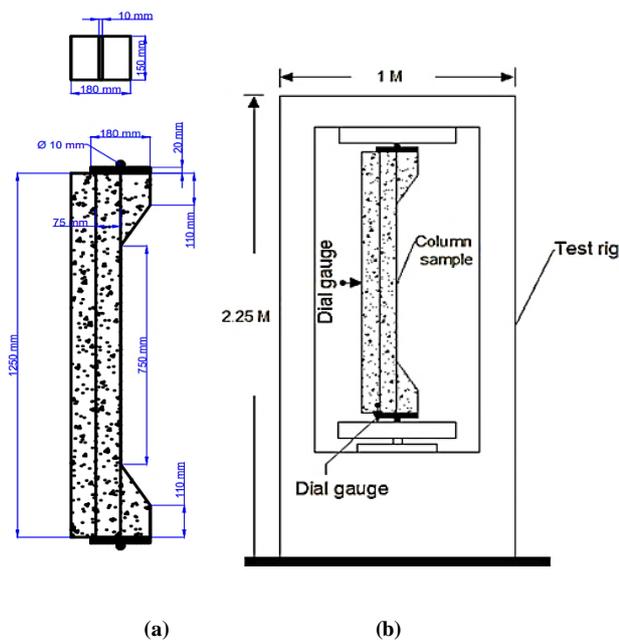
a) Eccentricity loading Setup, b) Installing measurements devices of column specimen
